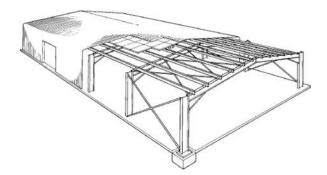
A typical arrangement of semi-form-active portal frames forming the structure of a single-story building. (Macdonald, Structure and Architecture, 1994, p. 56)
